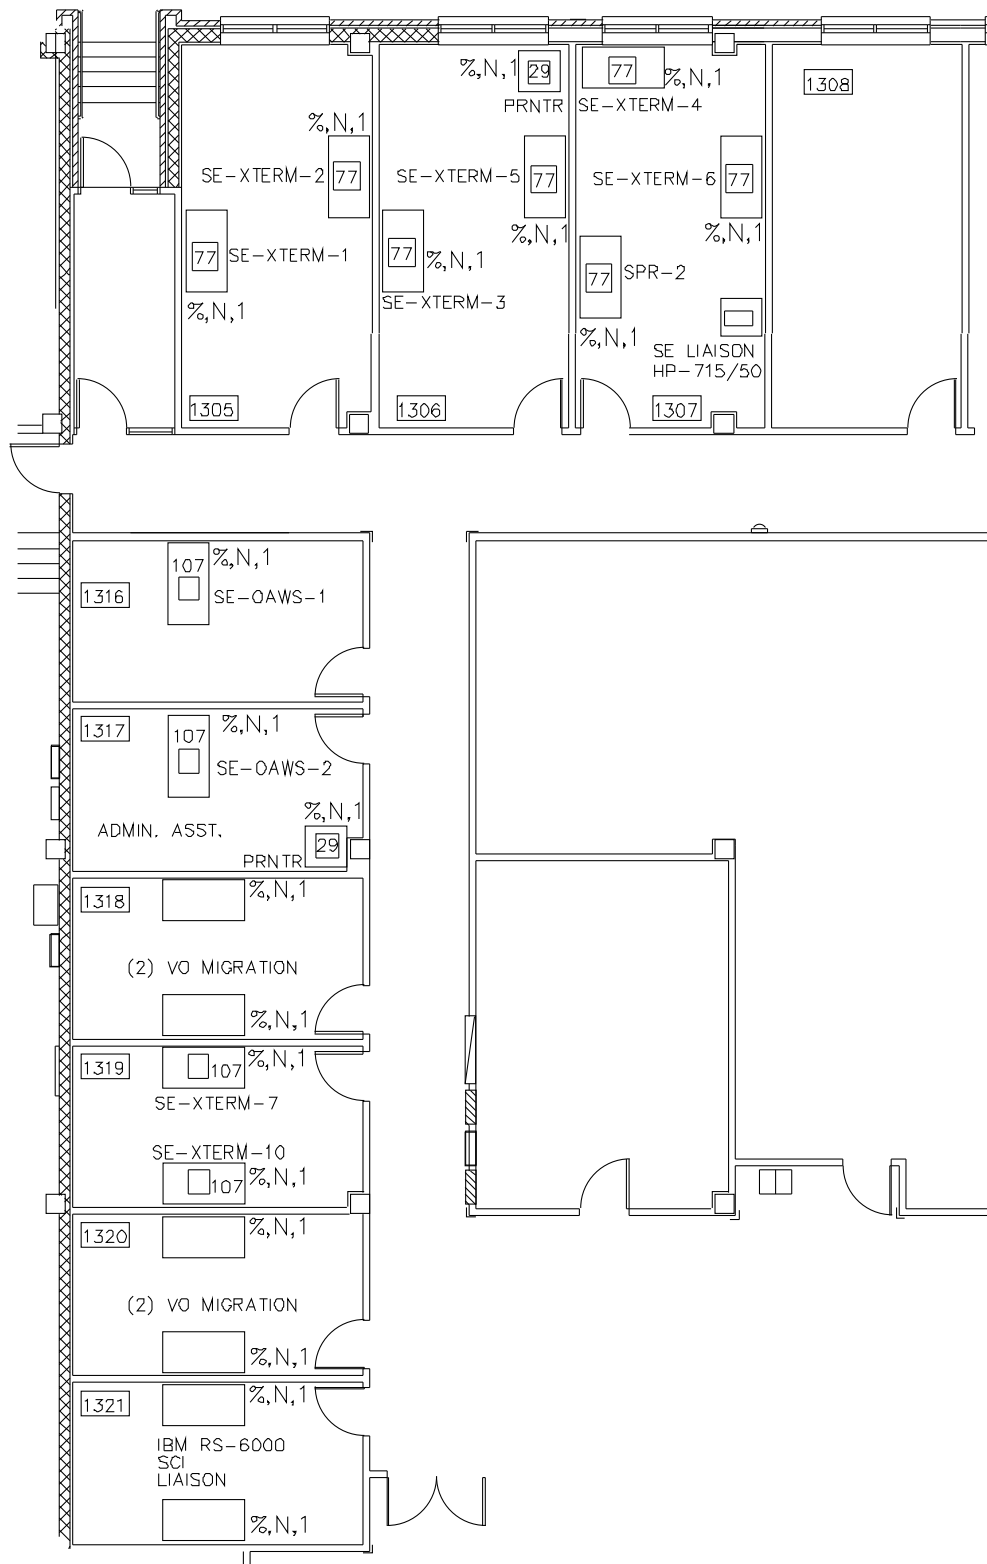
Floor Plan for LaRC (First Floor Offices)
